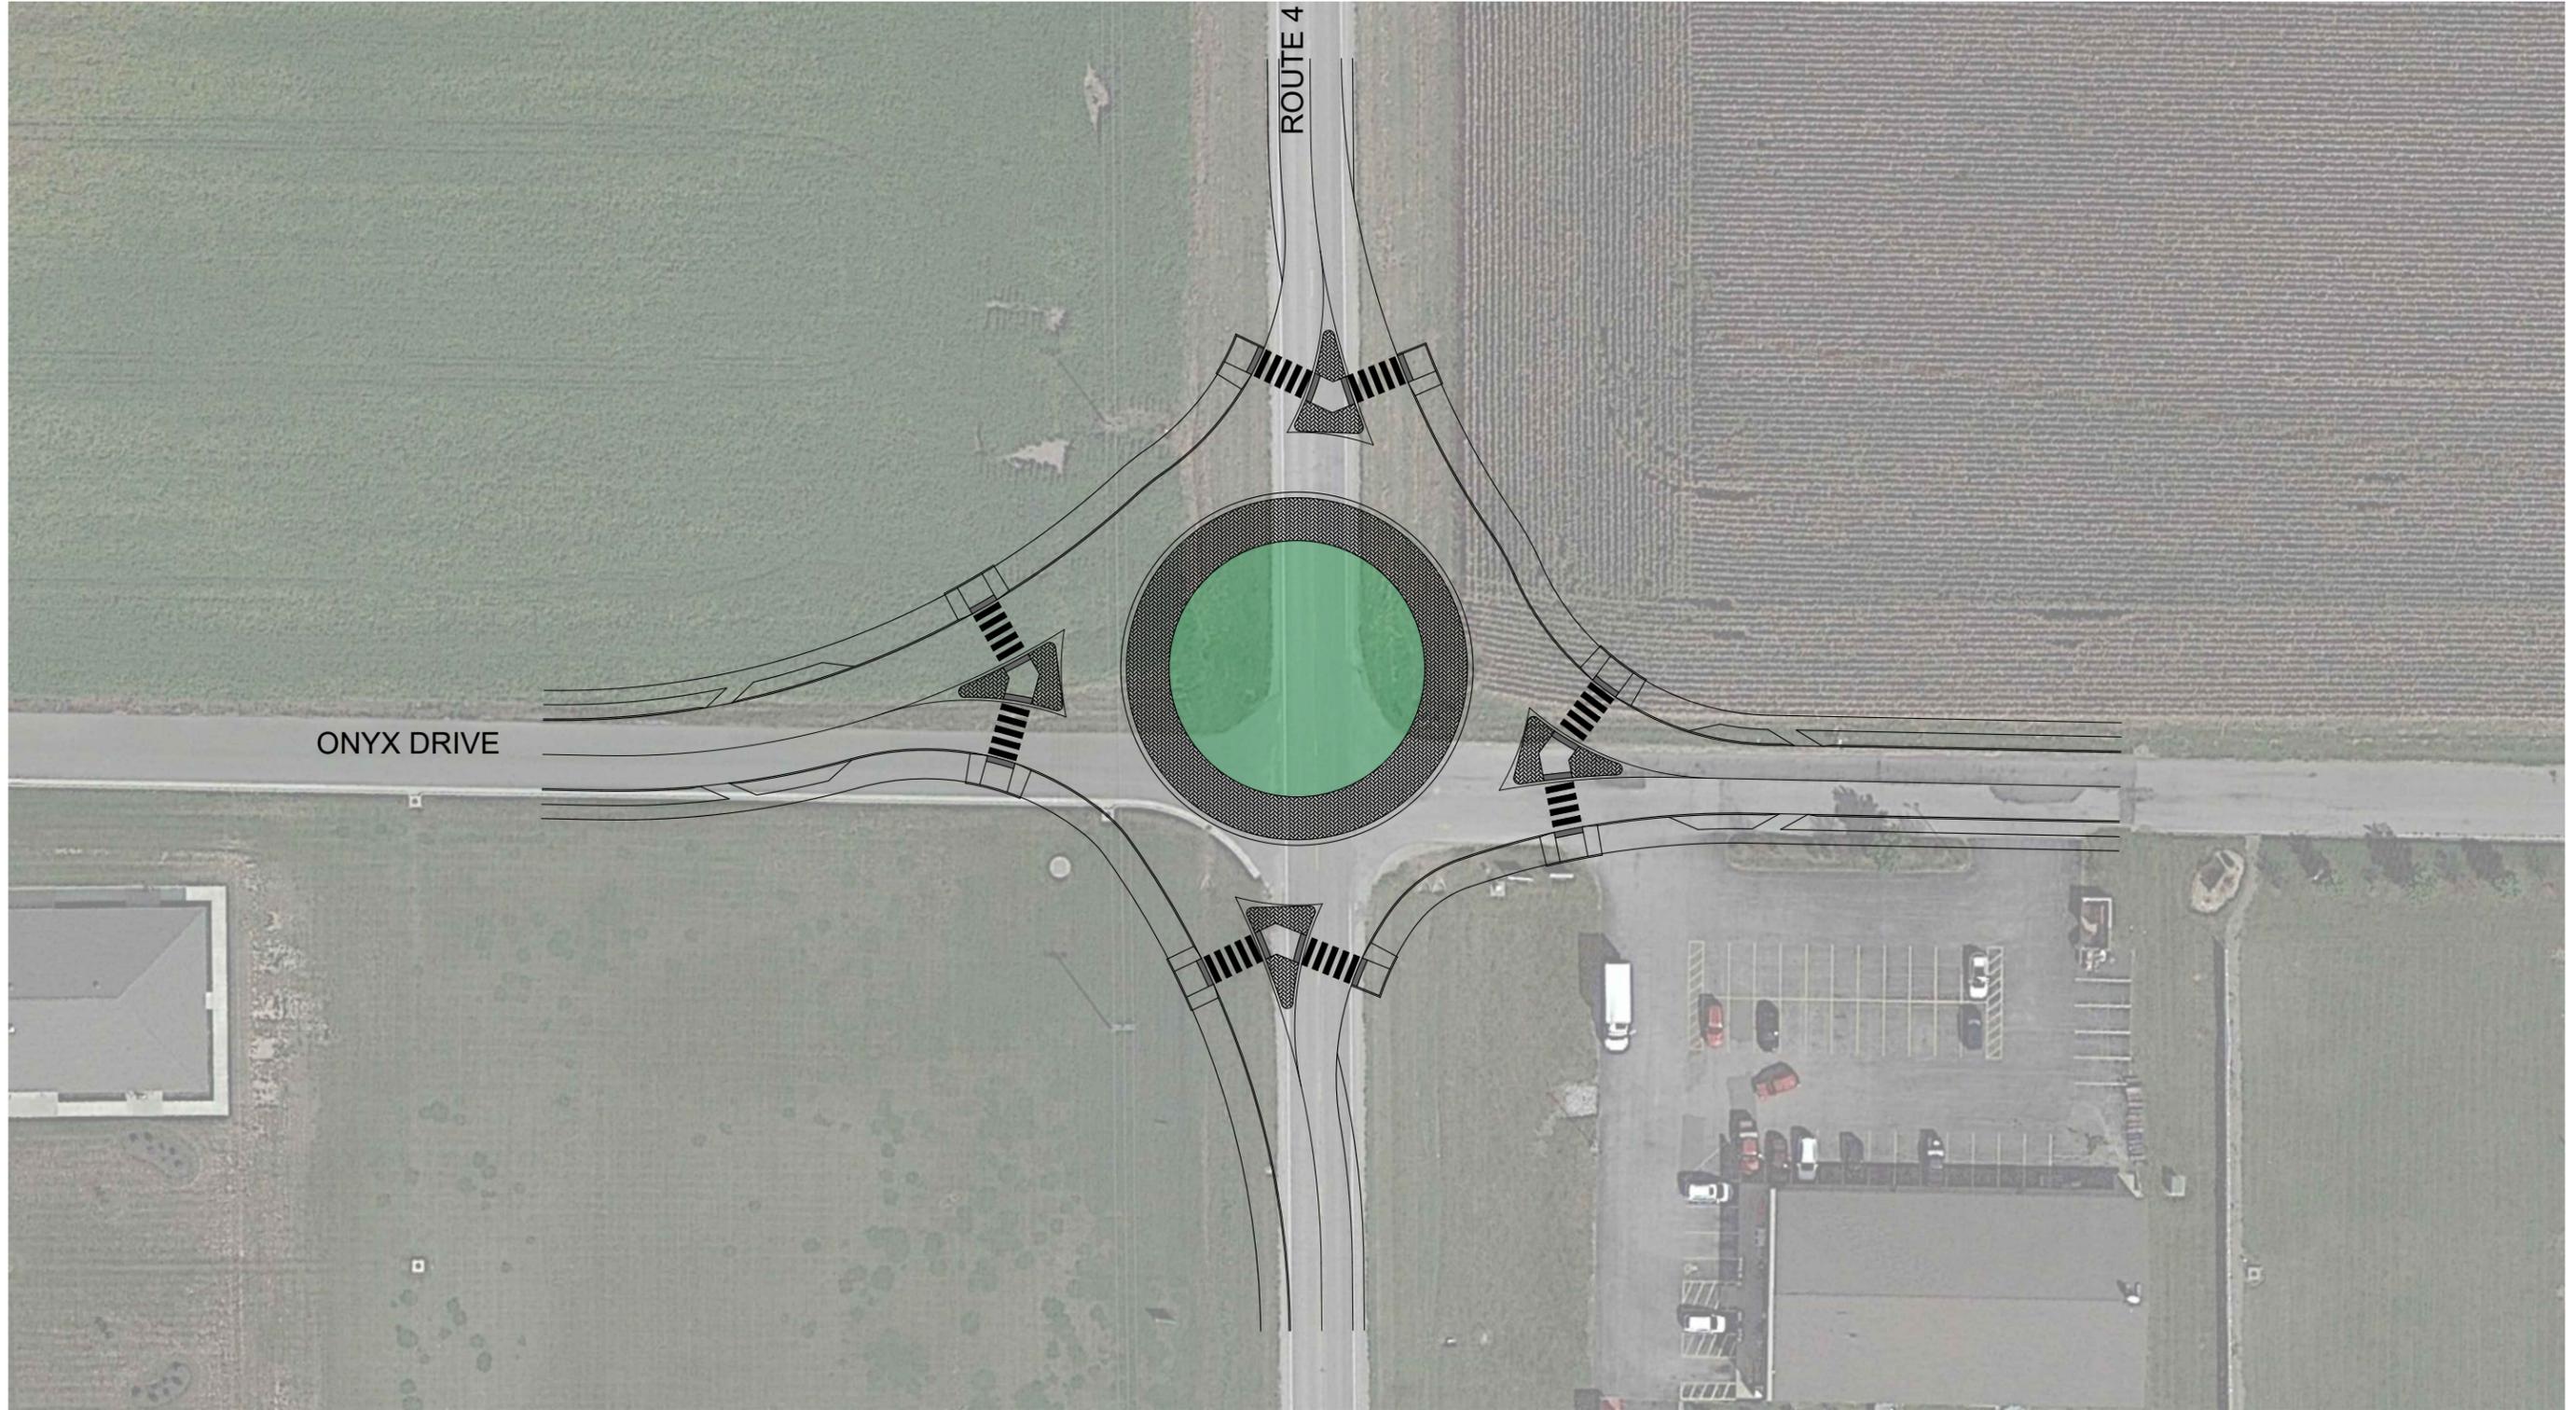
Route 4 and Onyx Drive Roundabout
